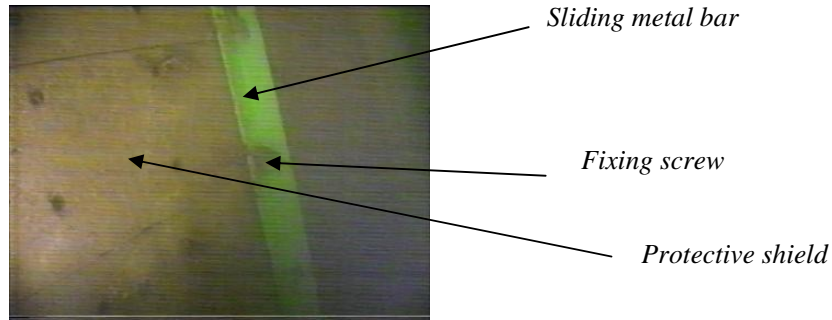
Underwater image of the upstream dam wall with sliding metal bar
